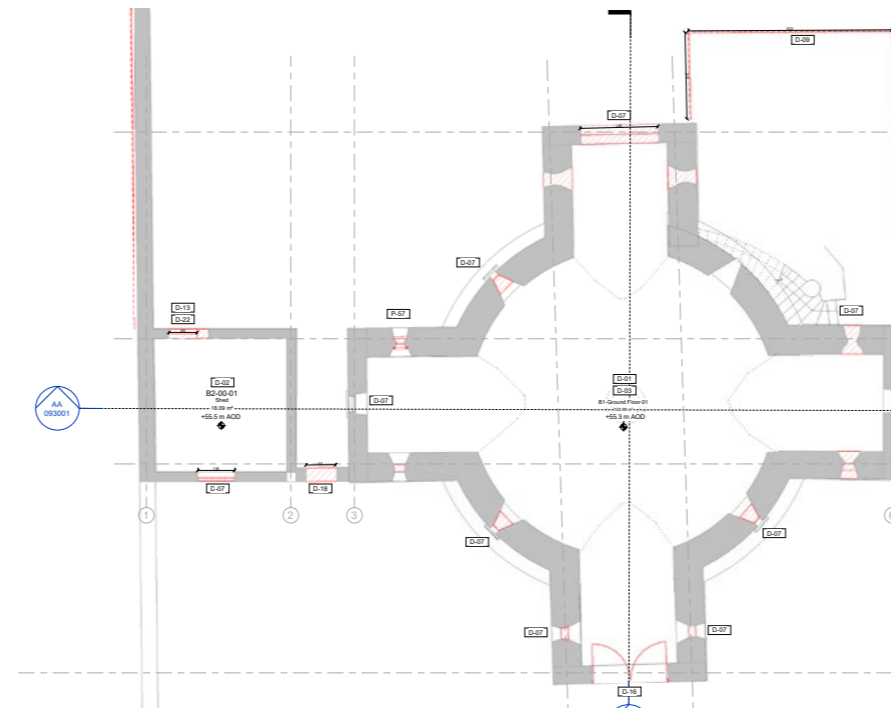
; Existing Ground and First Floor Plan. Removals in Red
